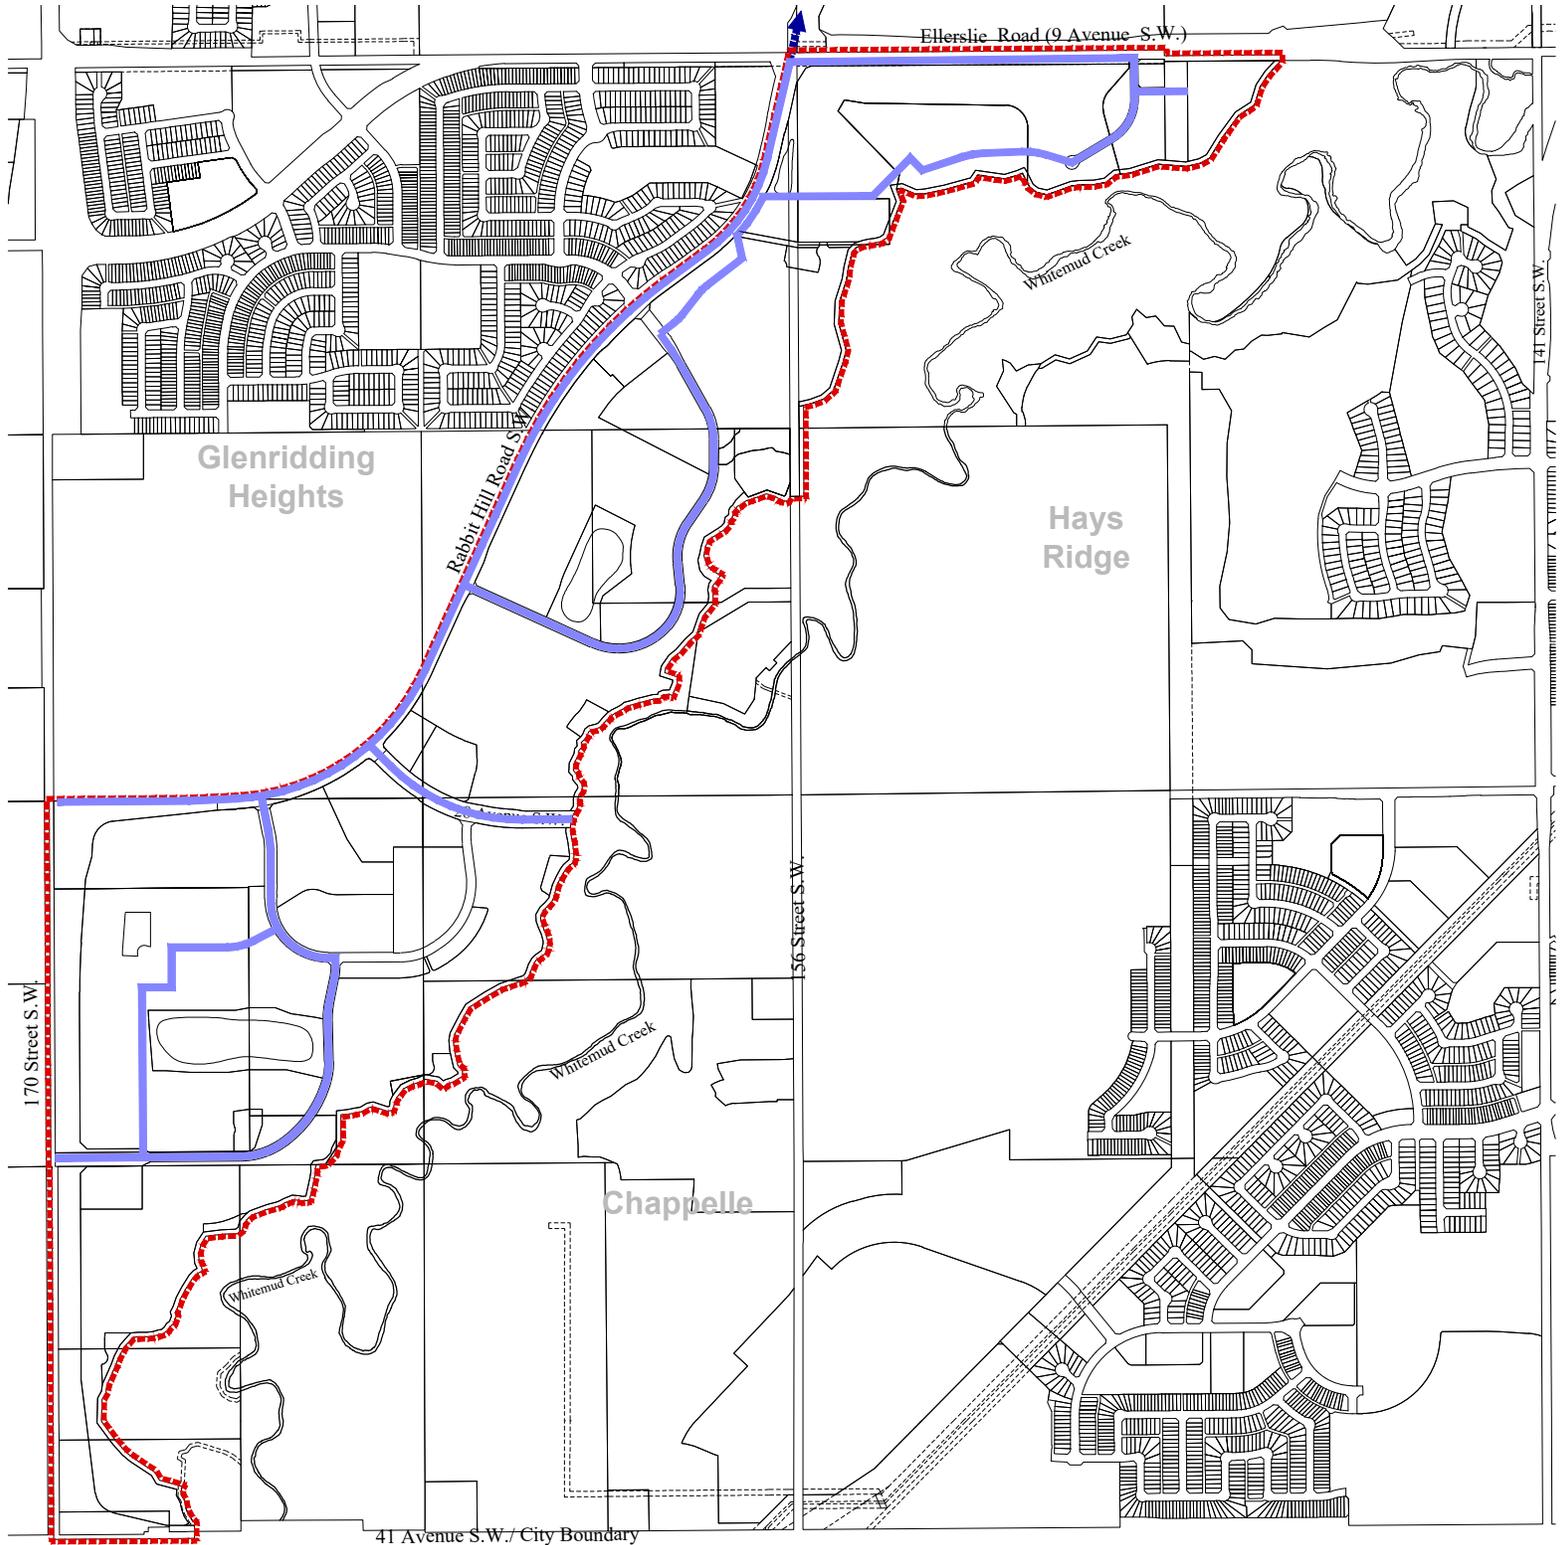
Stormwater Servicing Plan Glenriding Ravine - Neighbourhood Structure Plan
